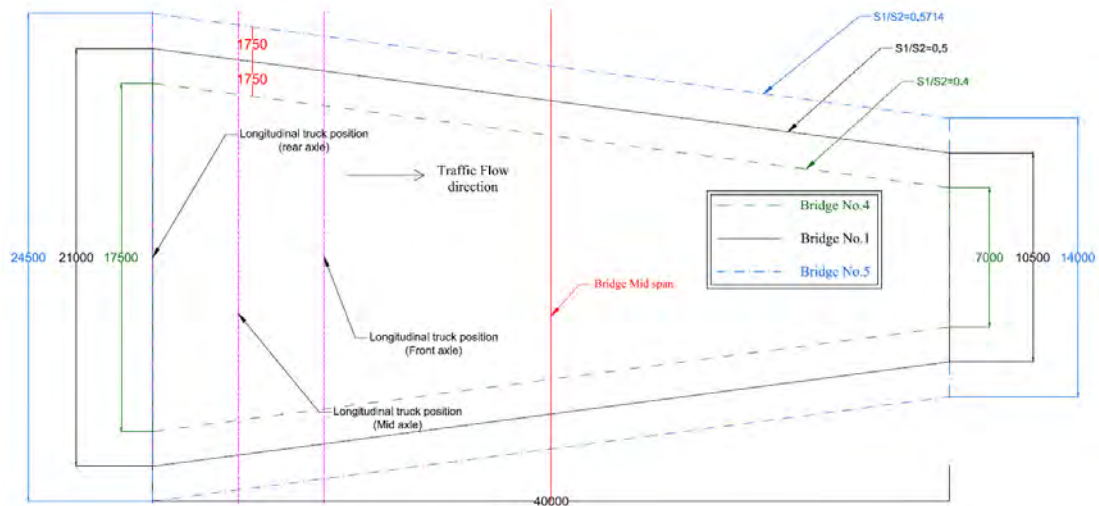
Bridges B1, B4, and B5 plan view - Shear
